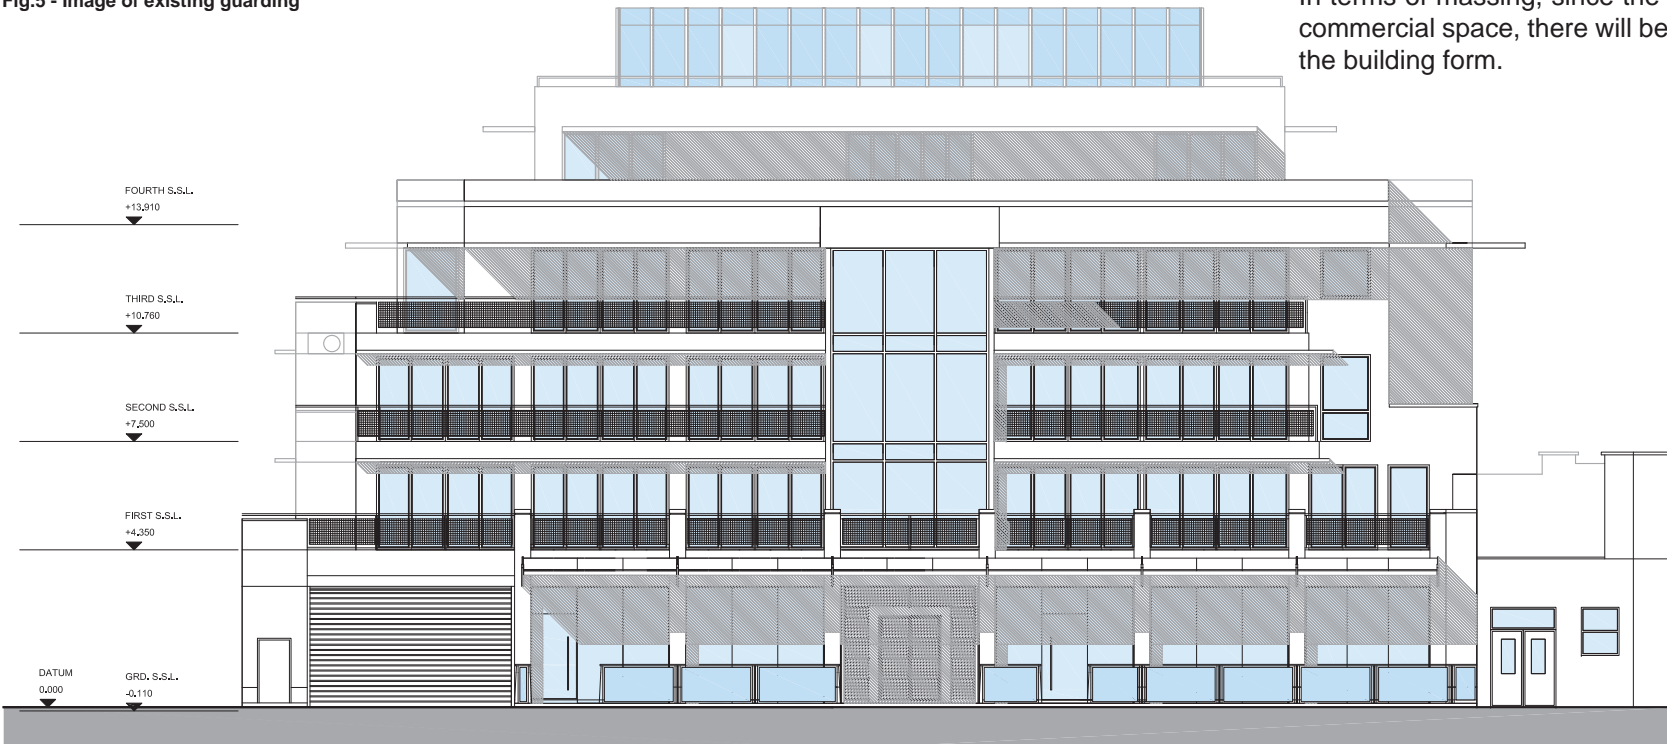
Holmes Road proposed elevation showing new glazed balustrade at street level
